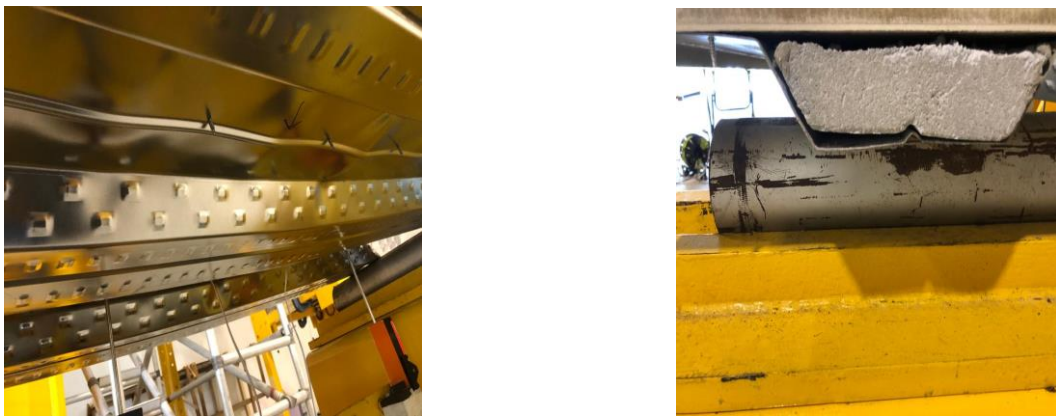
Buckling of Peva 50 and condition of foamed concrete
